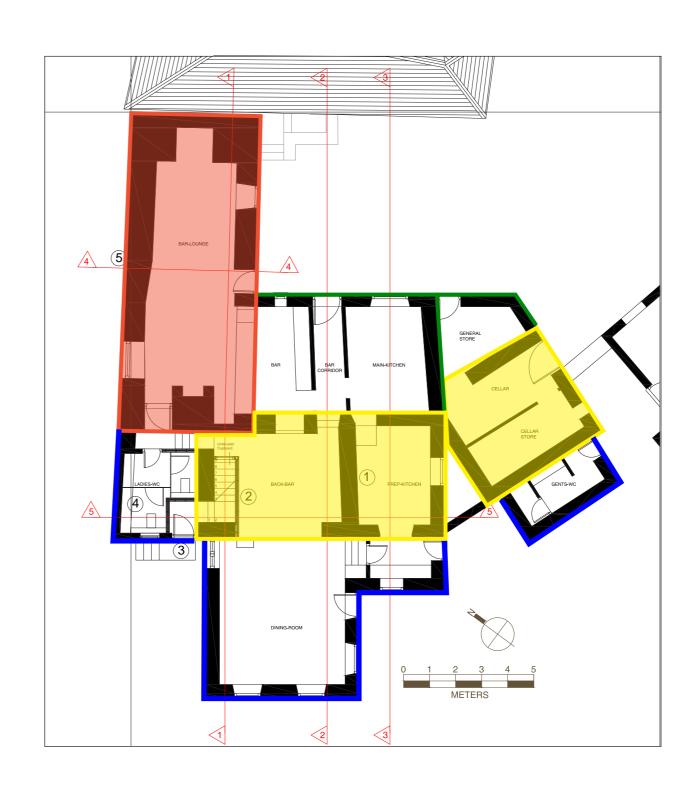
Proposed Ground Floor Plan Illustrating Development Chronology
